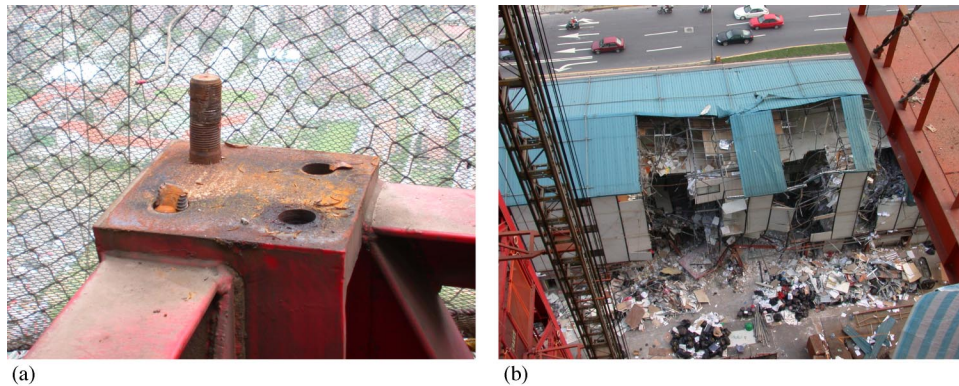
(a) Failure at the bolted column splice, and (b) damage at the construction site office caused by the falling counterweights.
